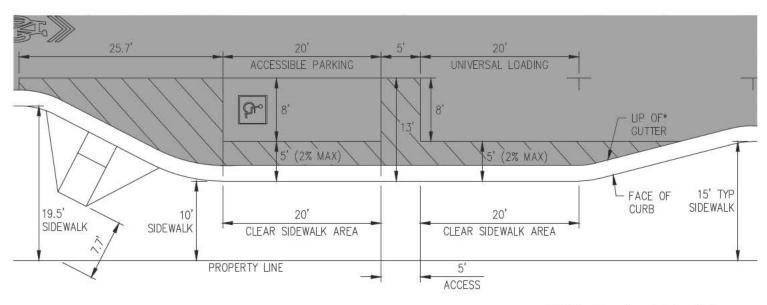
Universal Passenger Loading Zone and Accessible Parking Stall
